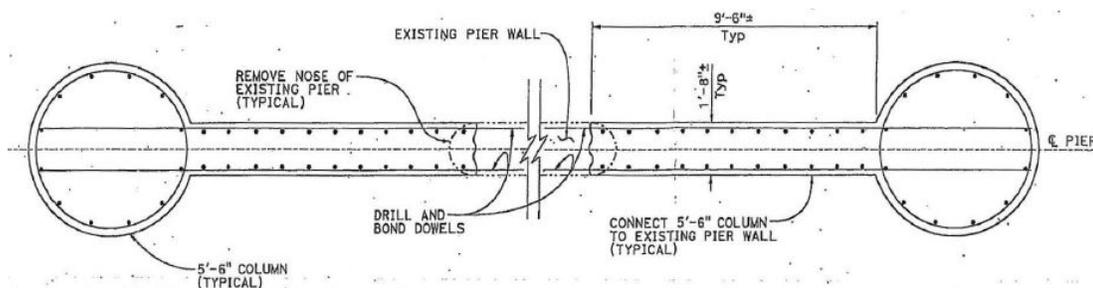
2 Proposed pier reinforcement (southbound bridge)
